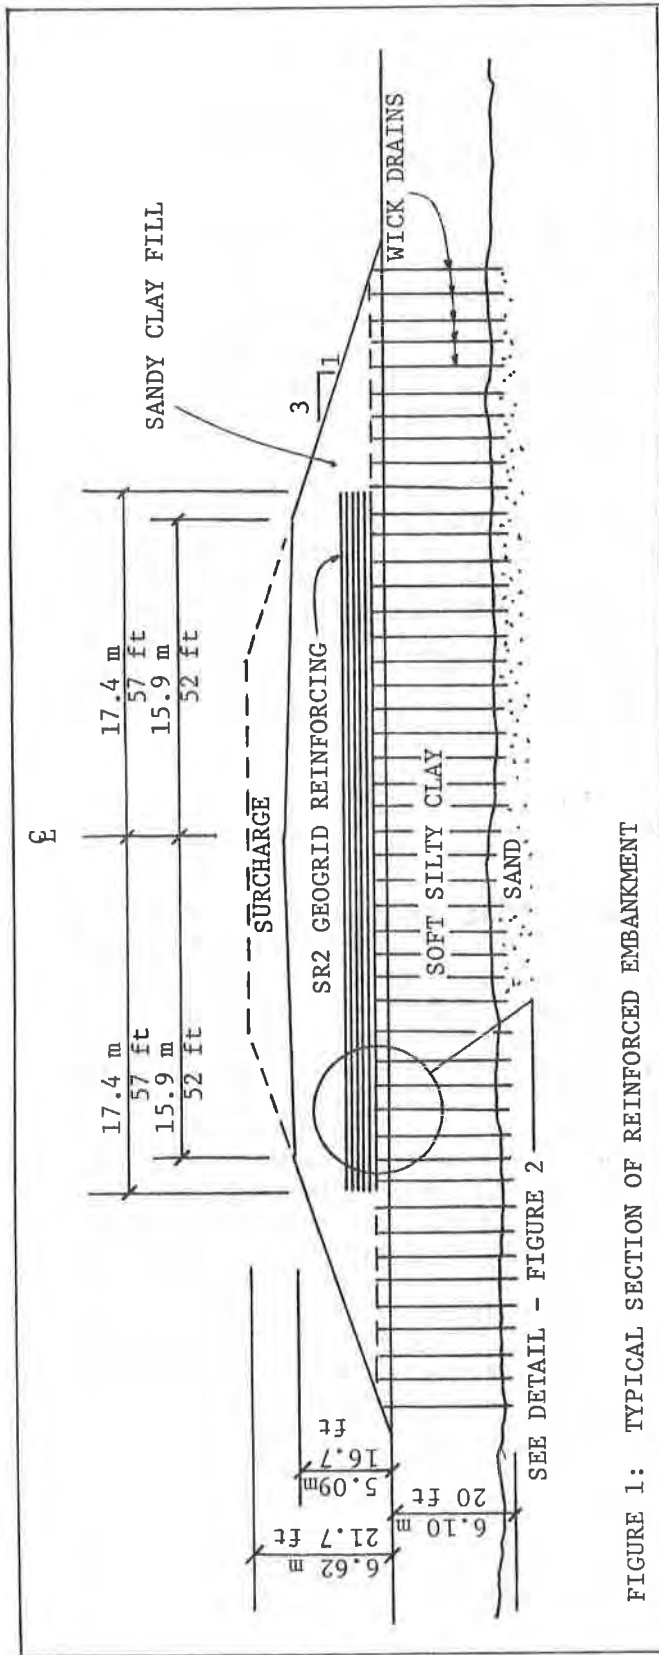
TYPICAL SECTION OF REINFORCED EMBANKMENT
